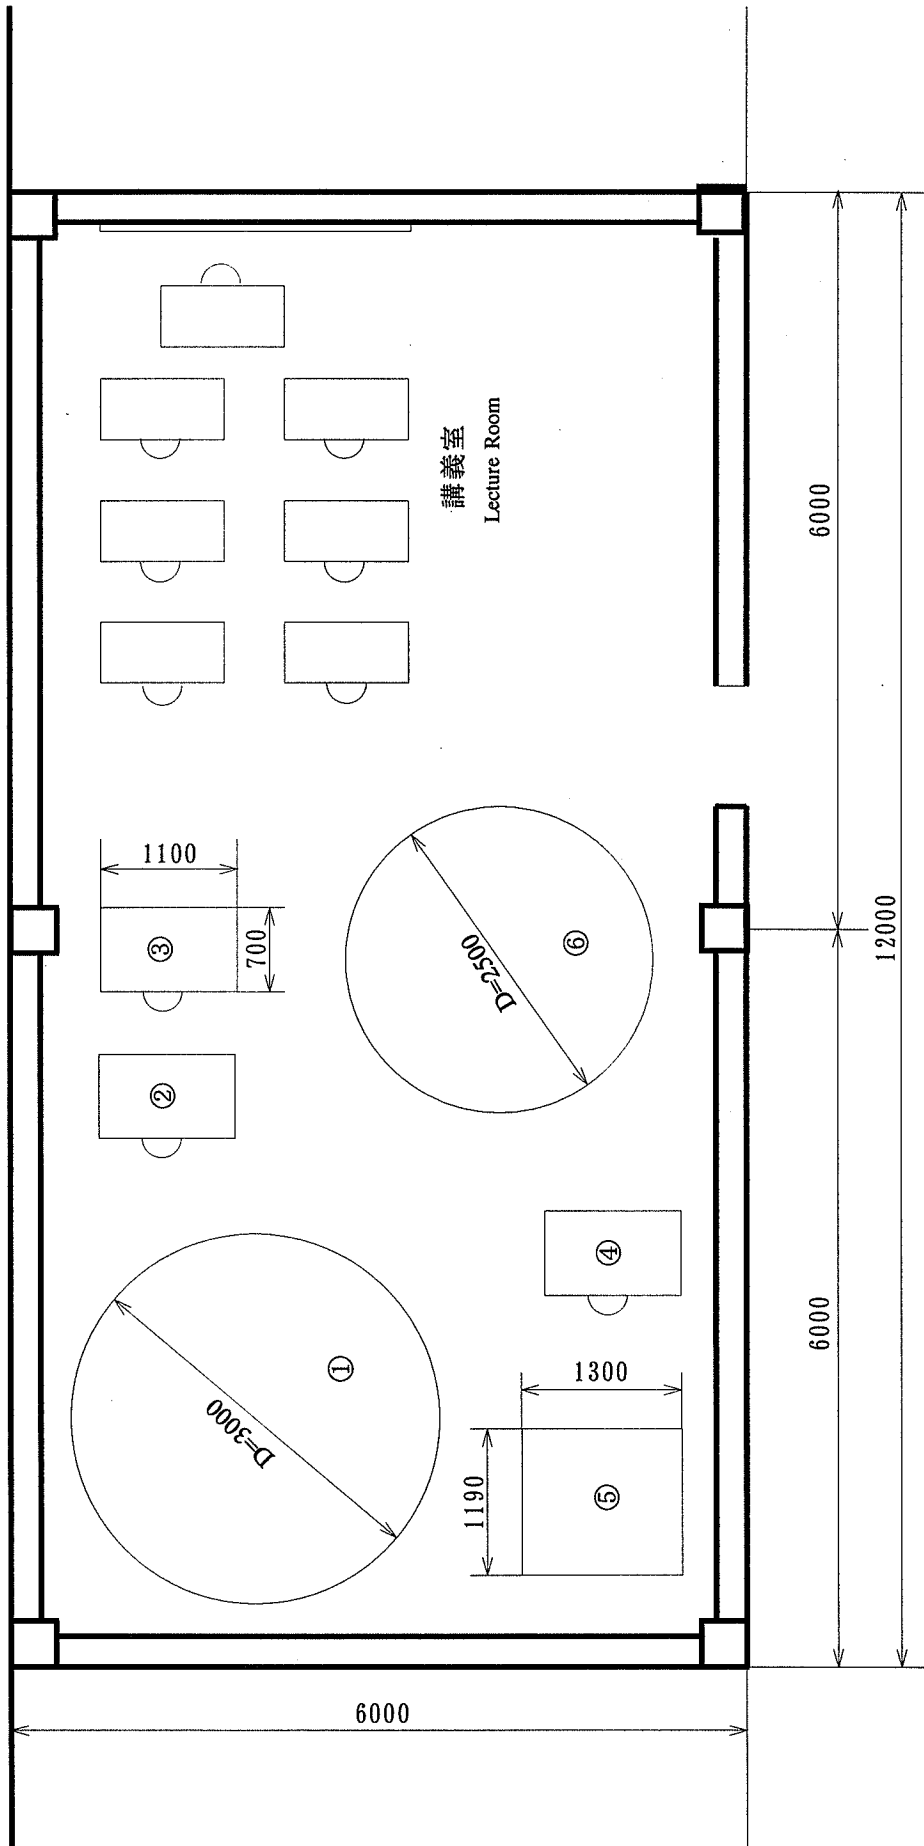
Layout Plan (7) Knitting Laboratory
